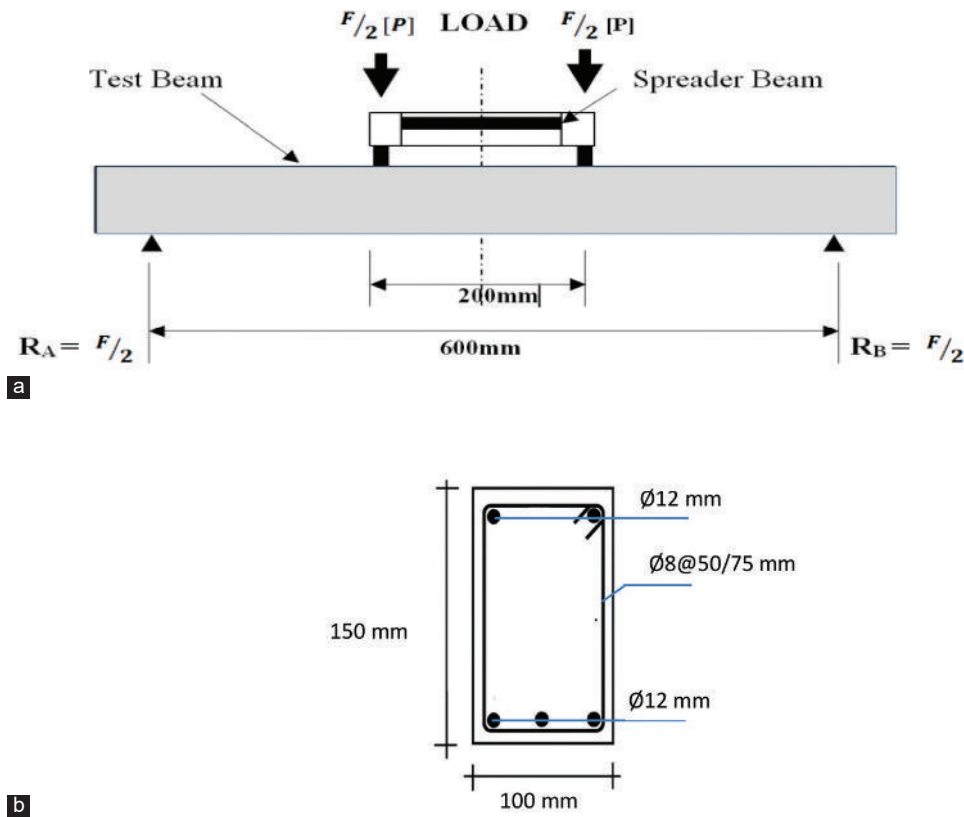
(a) Loading set-up for the reinforced concrete beams, (b) typical cross-section with steel bars and stirrups.
